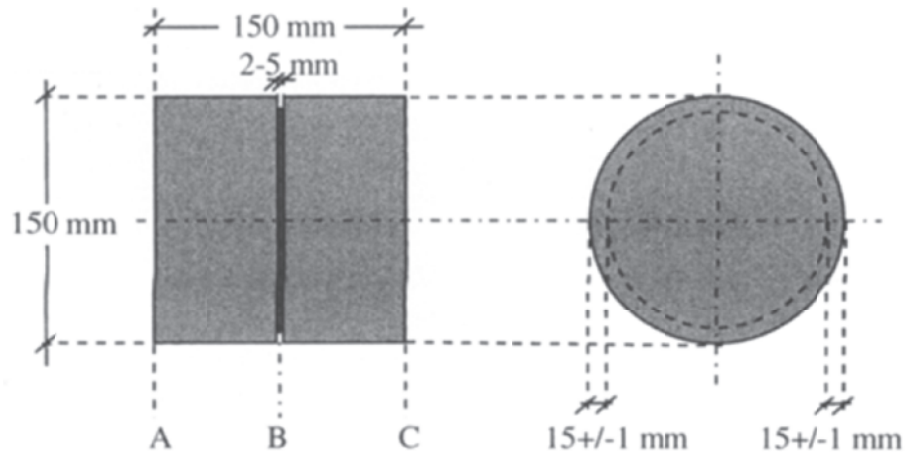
Standard specimen geometry (Vandewalle et al., 2001)
